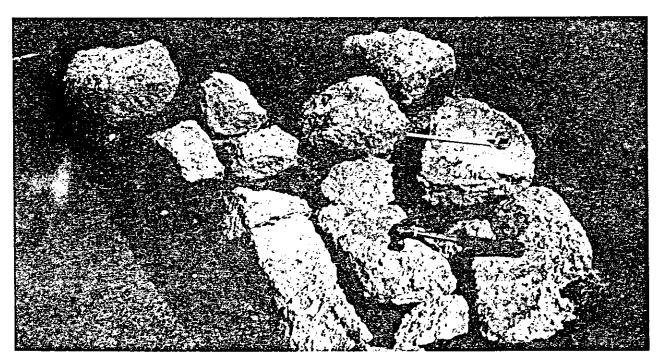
CHUNKS OF CTB SHOW IRREGULAR BREAKAGE UNDER SECTION 4 AFTER FAILURE.
